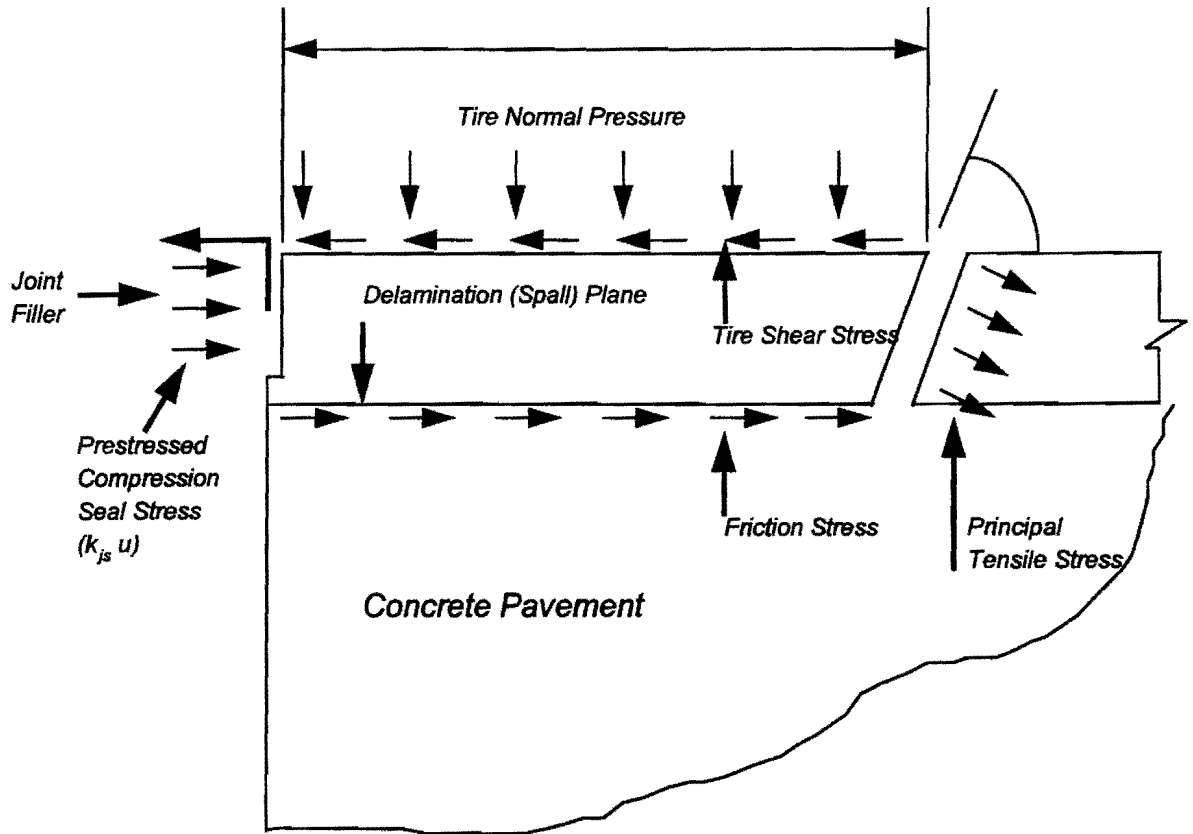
Schematic Diagram of Spalling Mechanism for Tensile Mode of Failure in Jointed Concrete Pavement
